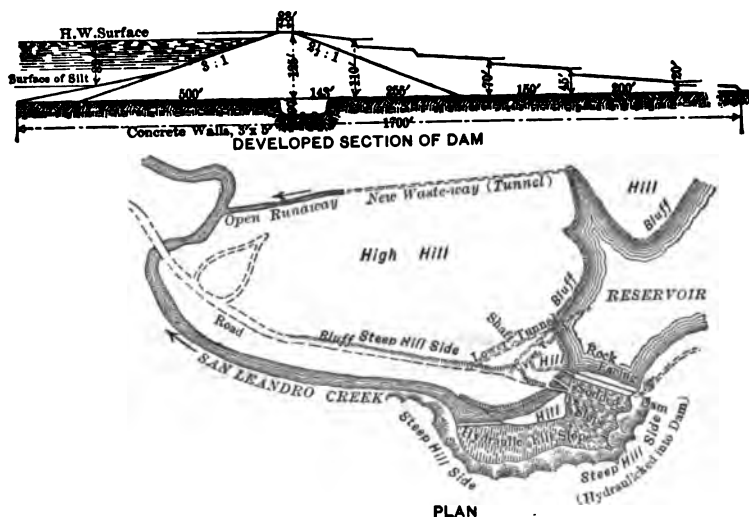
San Leandro Earth and Hydraulic-fill Dam, Oakland, Cal.
